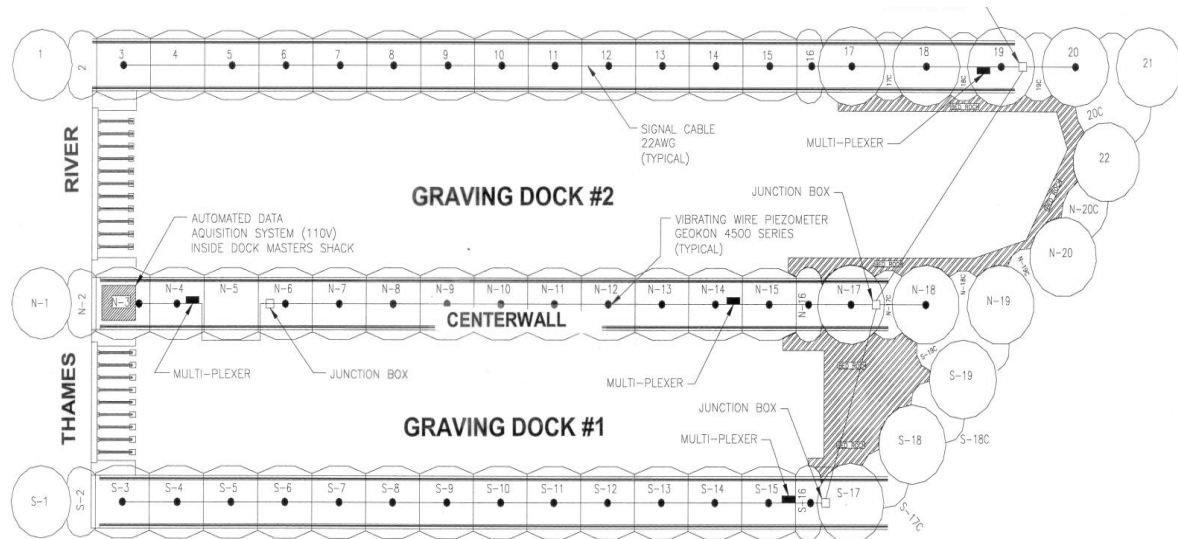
Plan view of GD 1 & 2 with Centerwall
